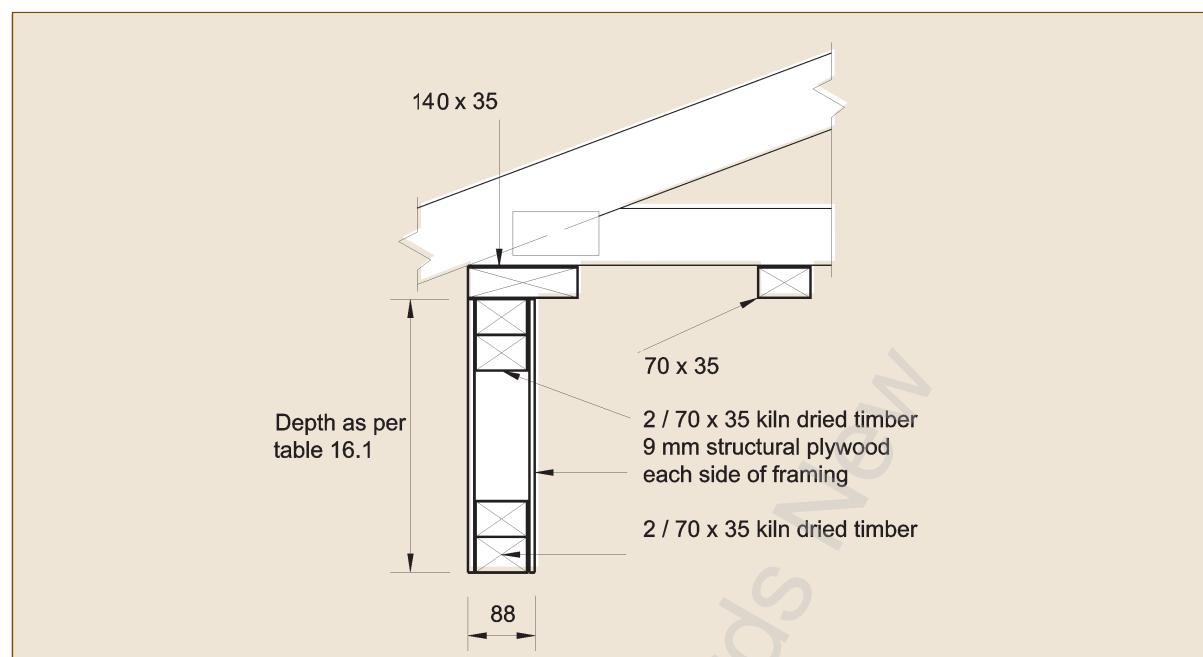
Built-up plywood box beam lintel – vertical section (see 8.6.1.7)
